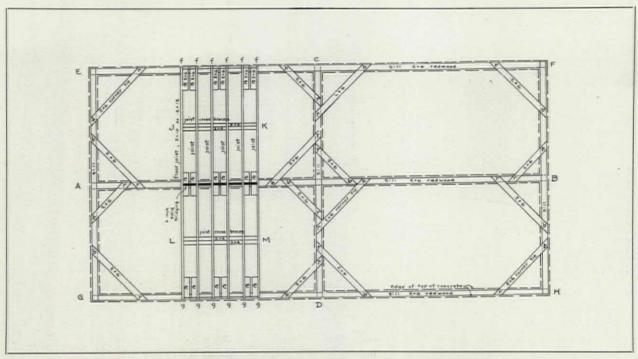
Corner Ties for Sill and Plate Underpinning. Method of Attaching and Bracing Floor Joists
